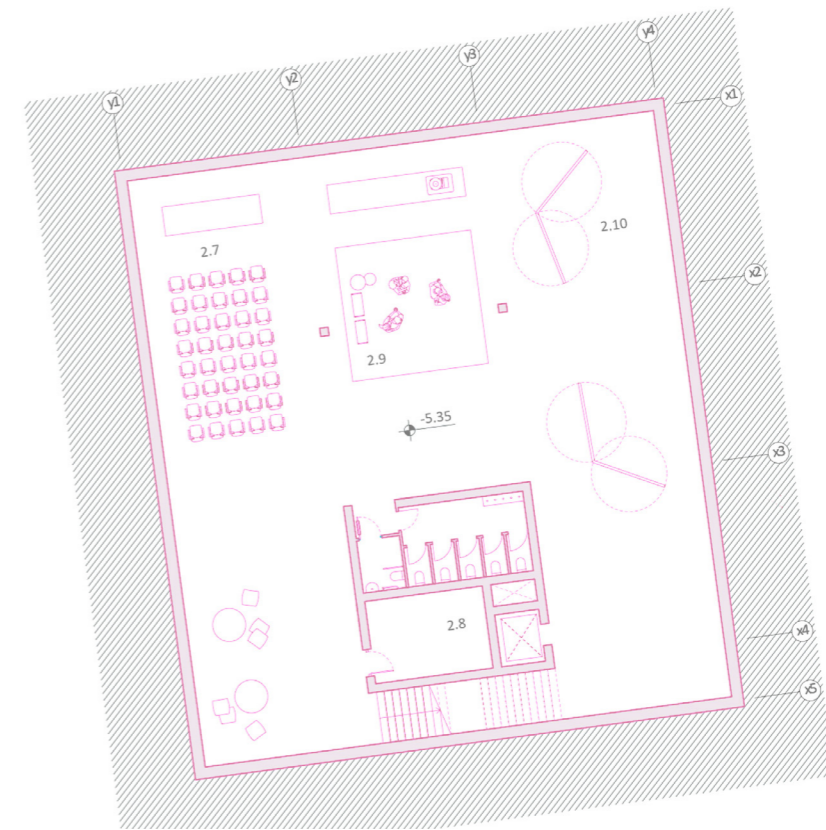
Docking station, underground, including flexible space for events, exhibitions and entertainment.
